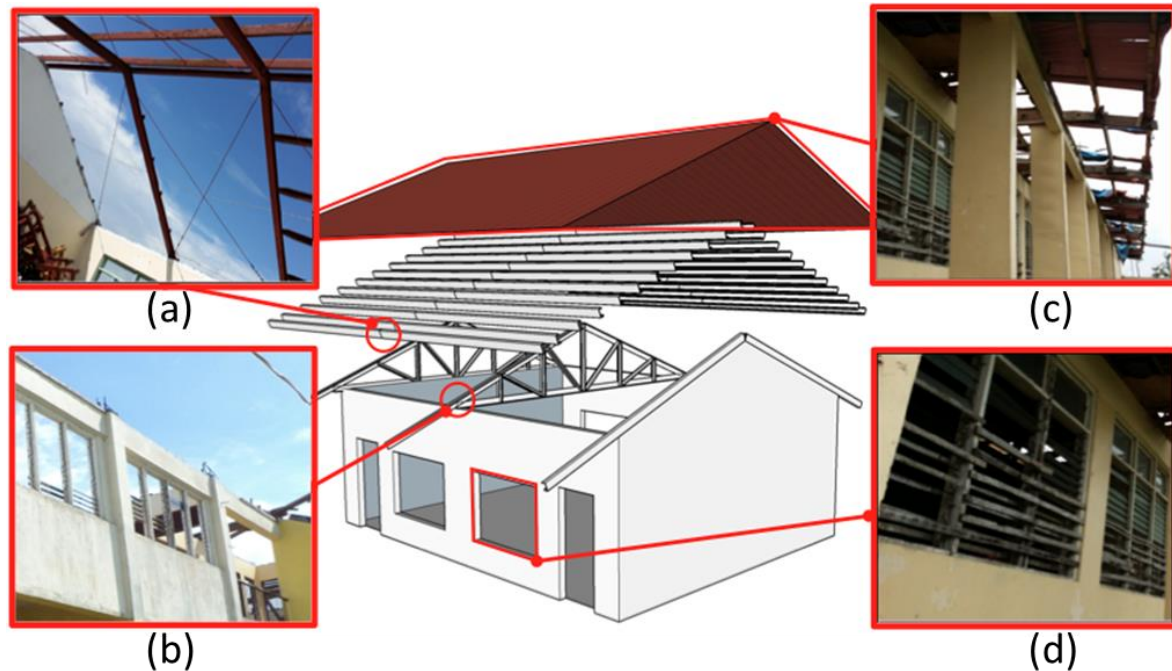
Commonly observed damages in buildings during the post-Yolanda survey. (a) Failure at the weld connection between purlins and roof truss/rafter, (b) unbending of the extended longitudinal rebars from the column that connects to the roof truss, (c) roof sheet failure either by nail pull-out or pull-thru, and (d) window jalousie breakage.
